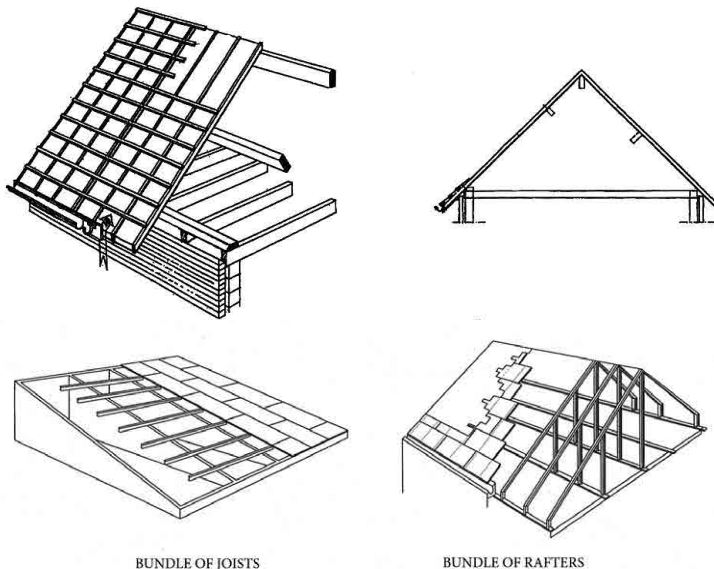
Bundle of joists supported on masonry work. Designs by Susana Mora.
